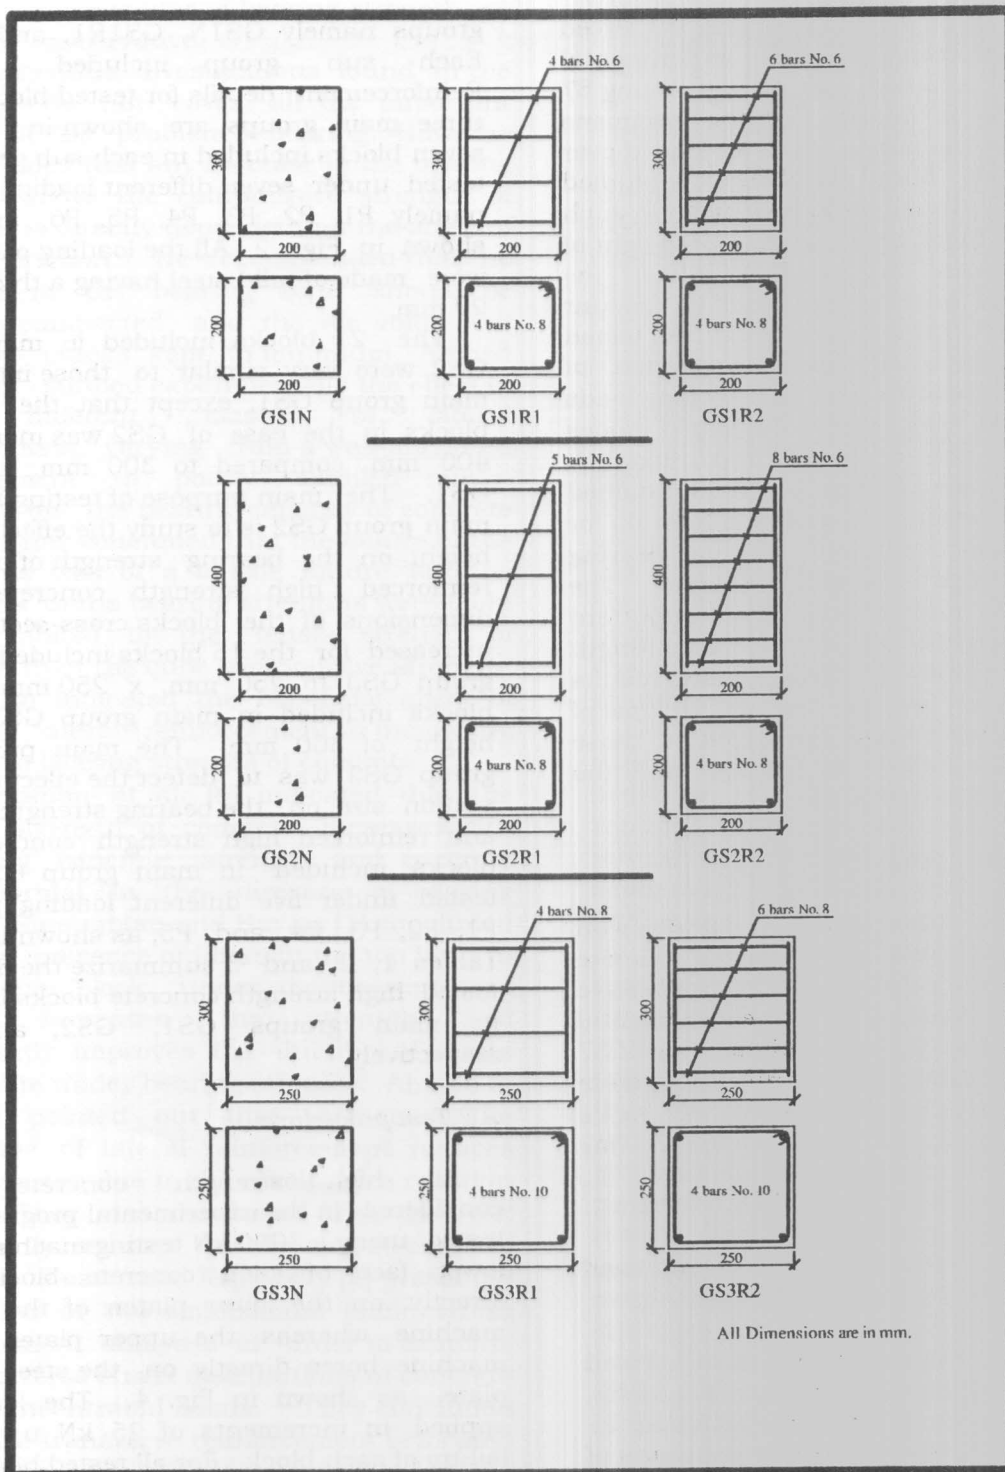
Reinforcement details for tested high strength concrete blocks.
